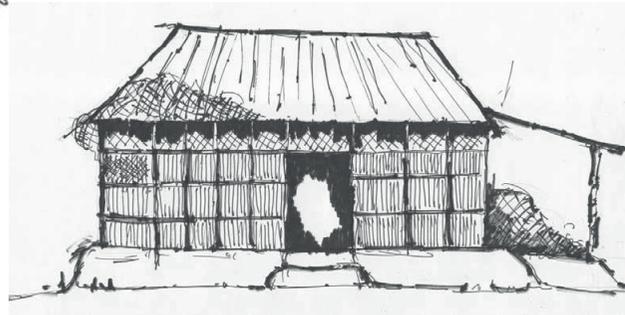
ELEVATION OF A TRADITIONAL HOUSE
